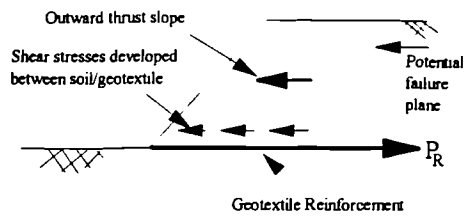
Application of direct sliding along surface of geotextile reinforcement
